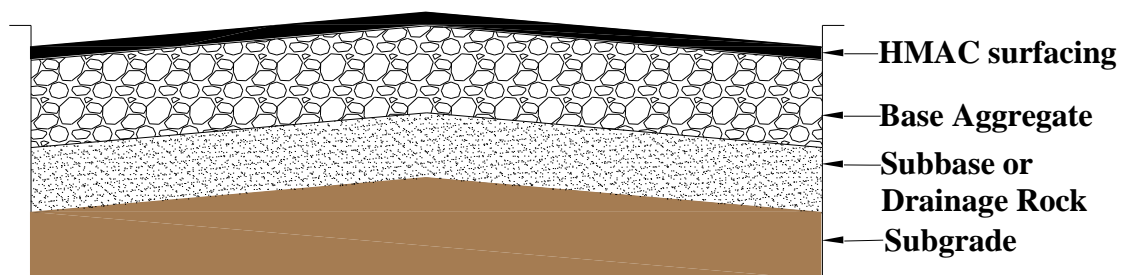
Typical City of Saskatoon Pavement Structure Cross Sections
